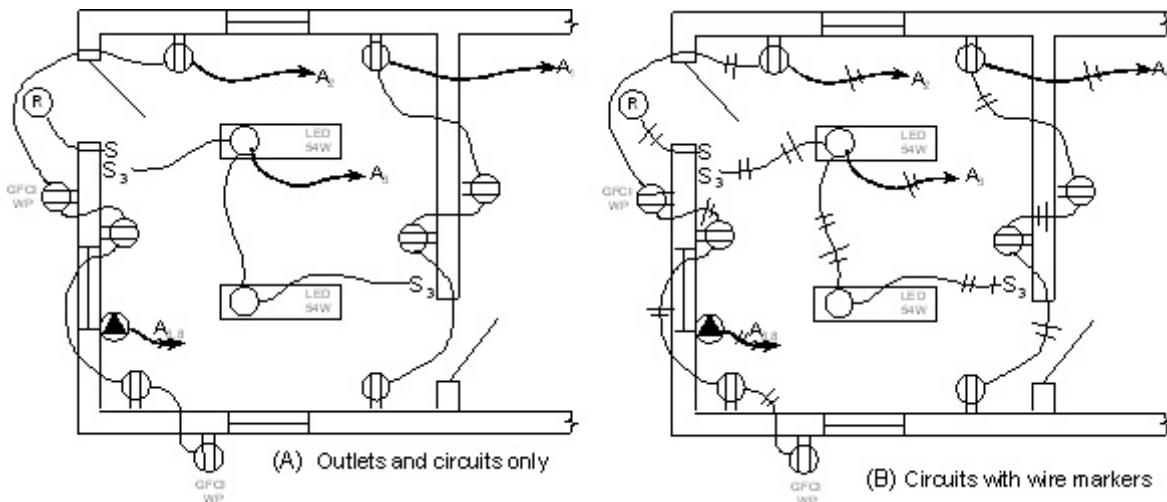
This is a typical plan of a portion of a building with the layout of receptacles, luminaires, and other fixtures. The diagram on the right has markings on the lines representing wires between devices indicating the number of circuit wires on each run.
